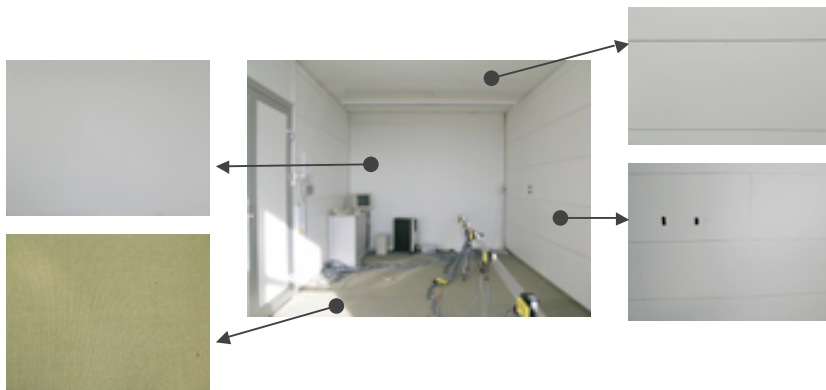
Internal view of the real building (walls, ceiling and floor)
